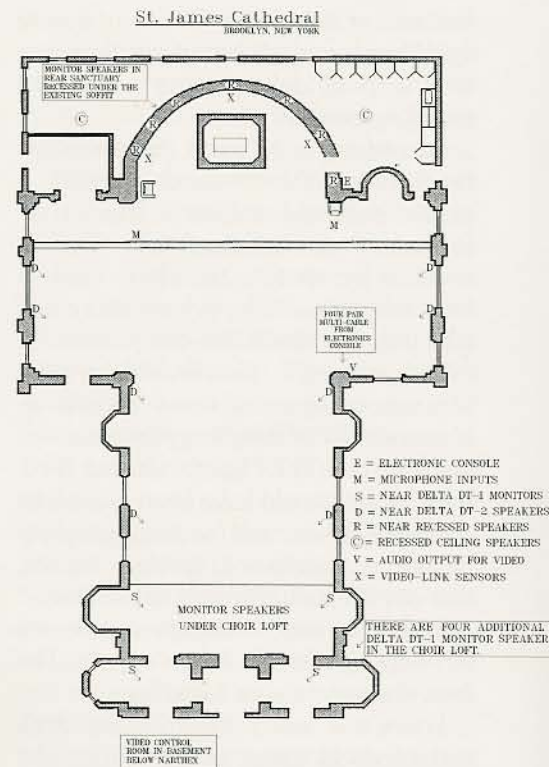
Floor plan of St. James Basilica in Brooklyn, New York.
